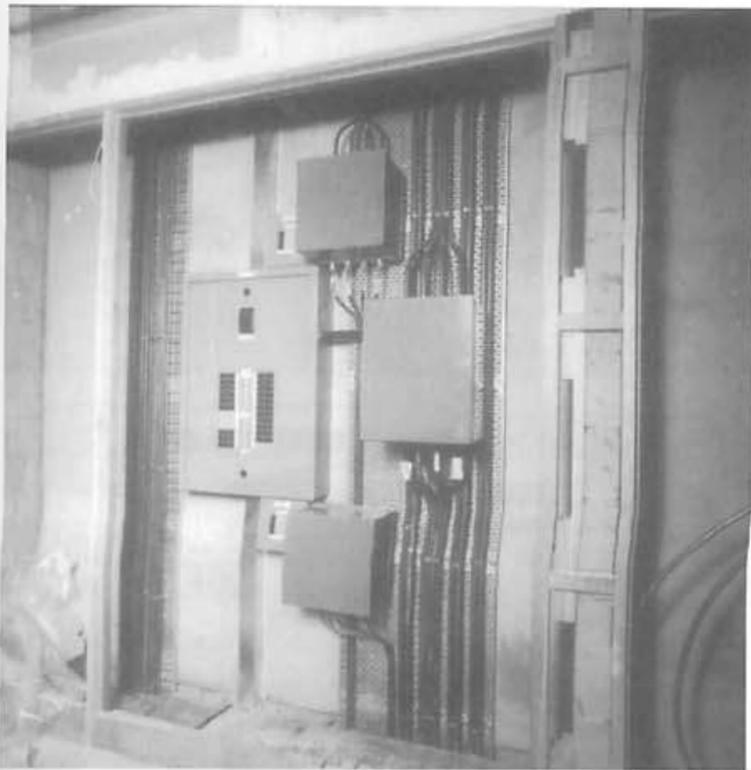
Wiring in a multistorey building showing tee-off from rising mains for the floor section MM CABLES PYROTENAX
